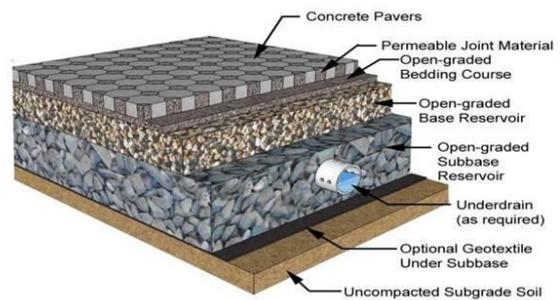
PAVEMENT DESIGN IN ROAD CONSTRUCTION
